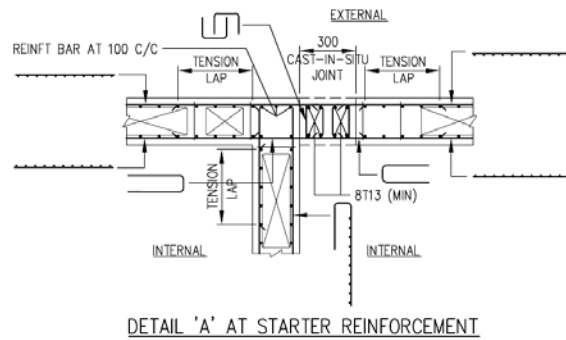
CONNECTION DETAILS BETWEEN TWO PRECAST HS
